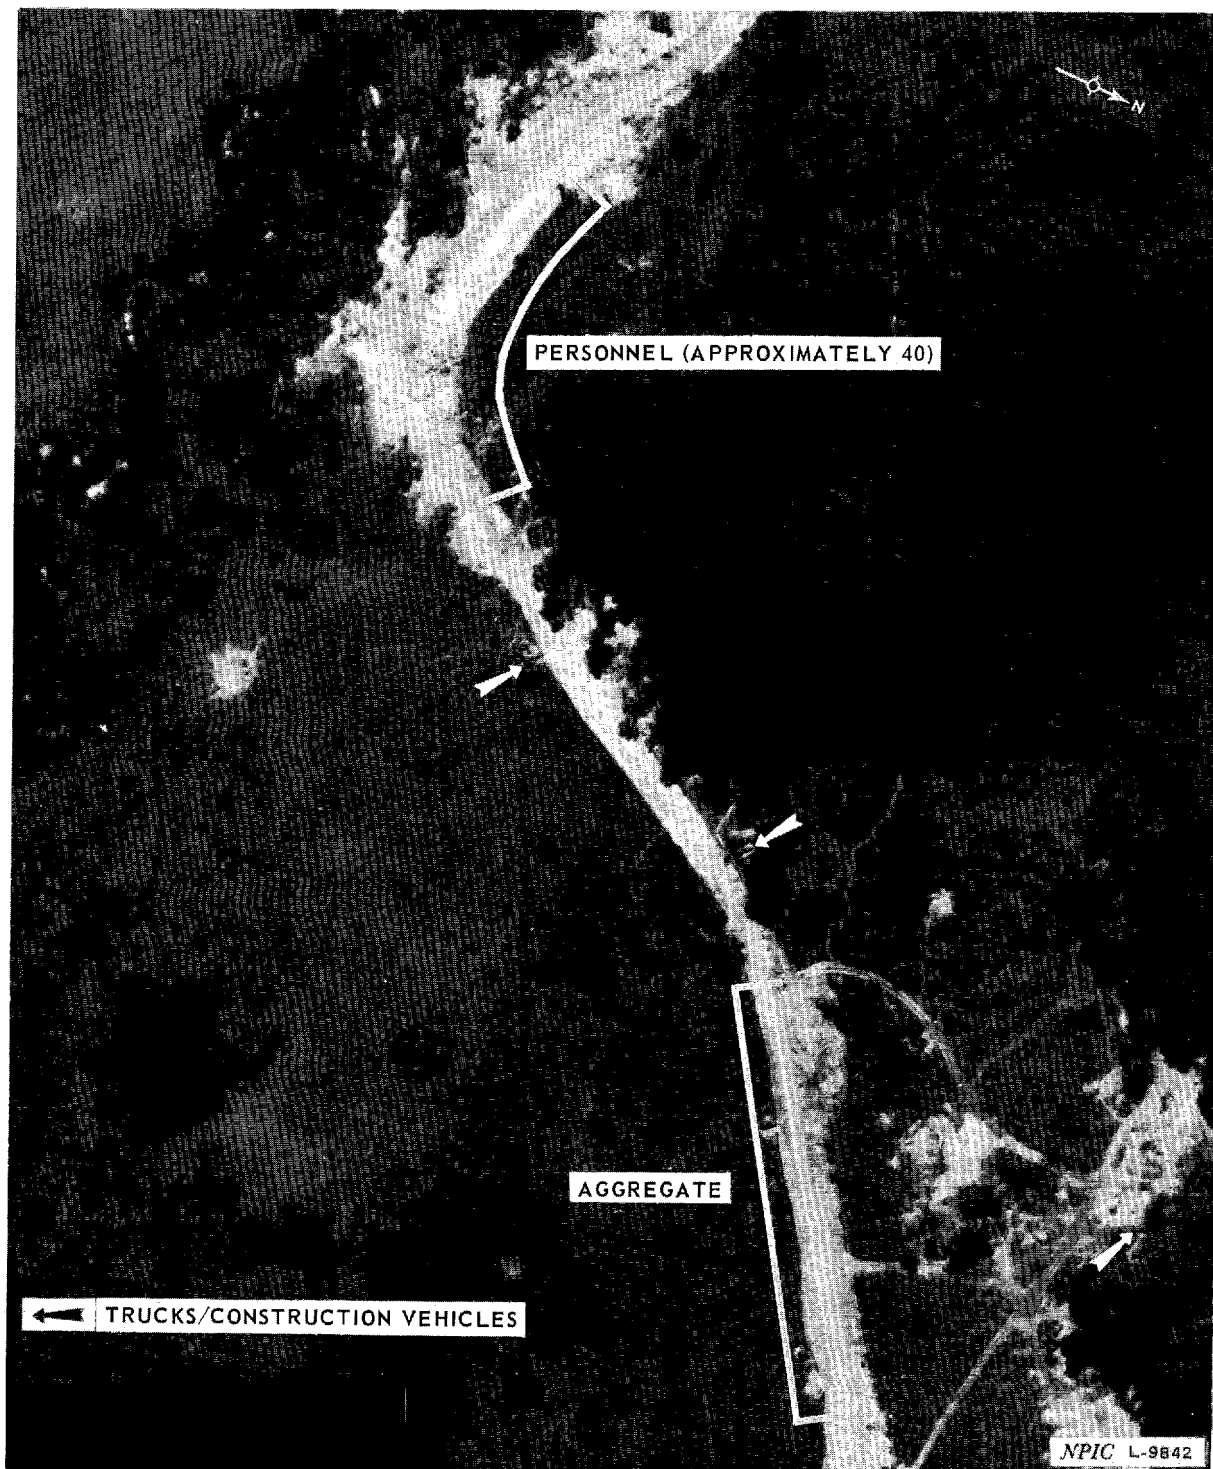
ROAD IMPROVEMENT, ROUTE 19, NORTH VIETNAM
